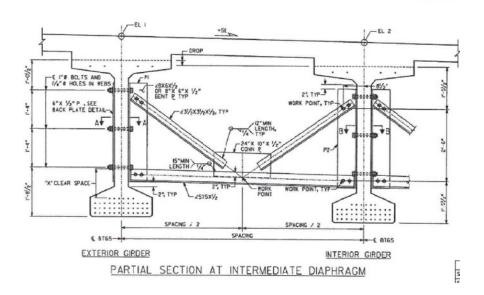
Drawing. Partial section at intermediate diaphragm of Span 14 of Bridge 11B
